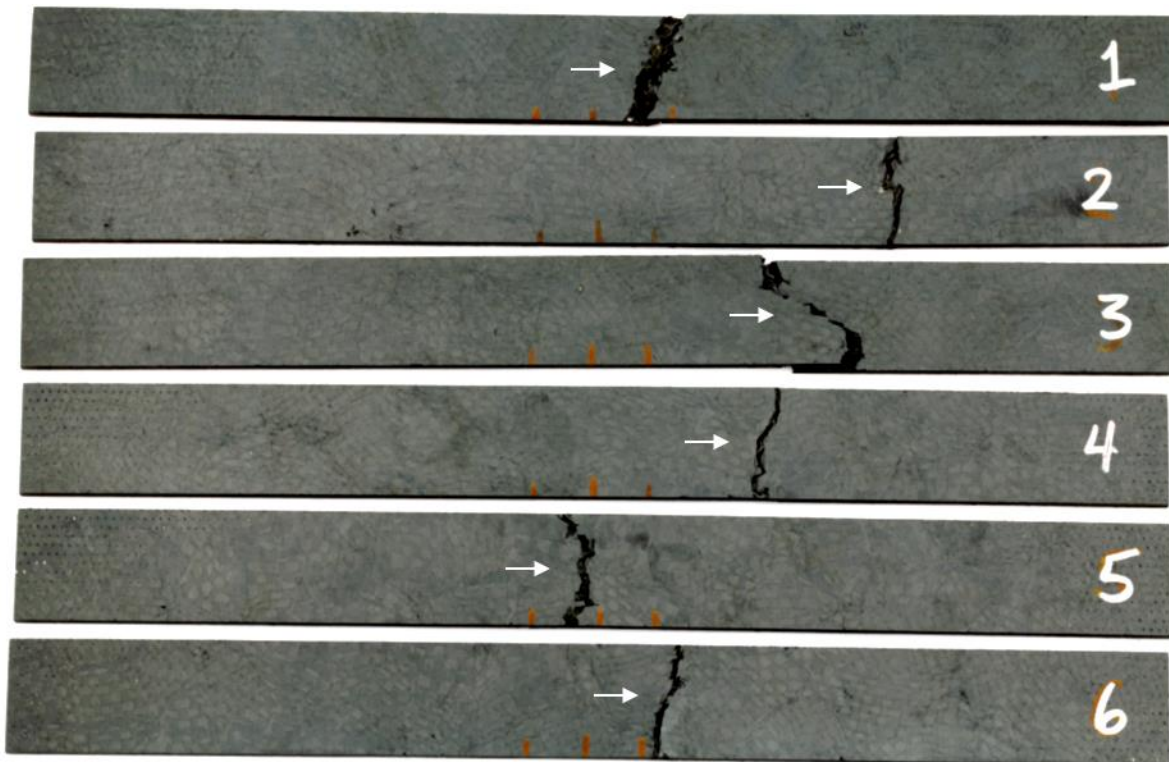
Picture of tested M40 specimens; white arrows indicate the location of failure.
